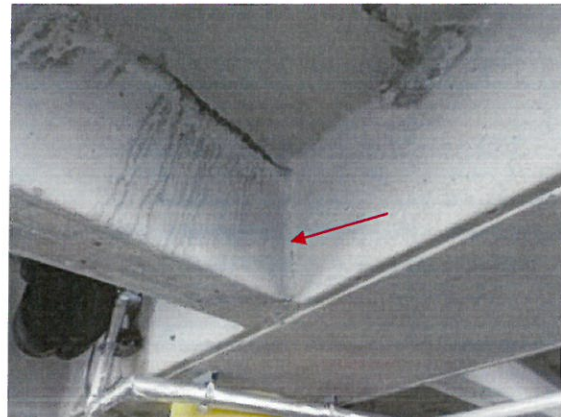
Crack at end of joist typical at select location on the underside of the roof level
